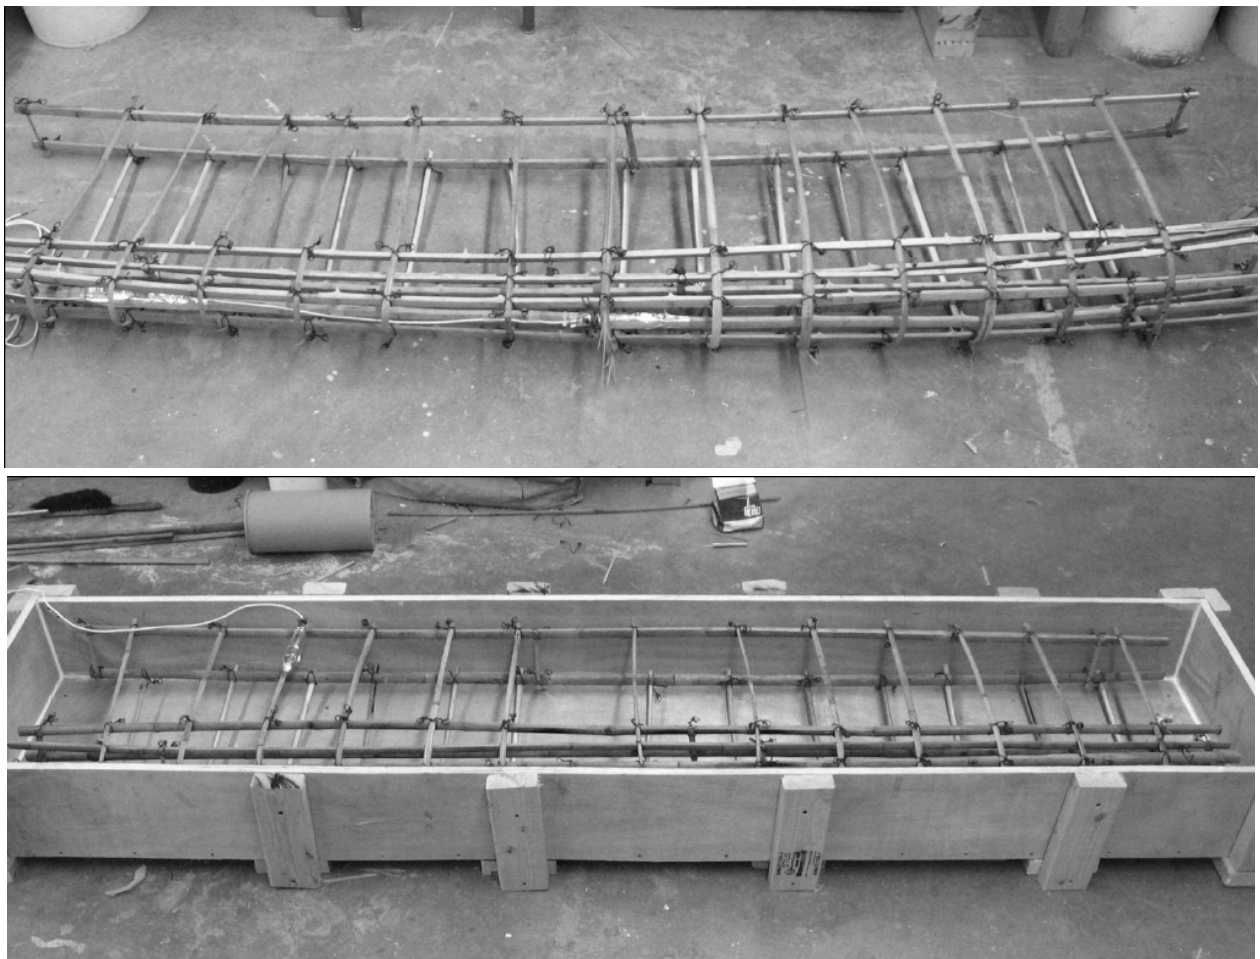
Bamboo reinforcement before and after placement in wood formwork
